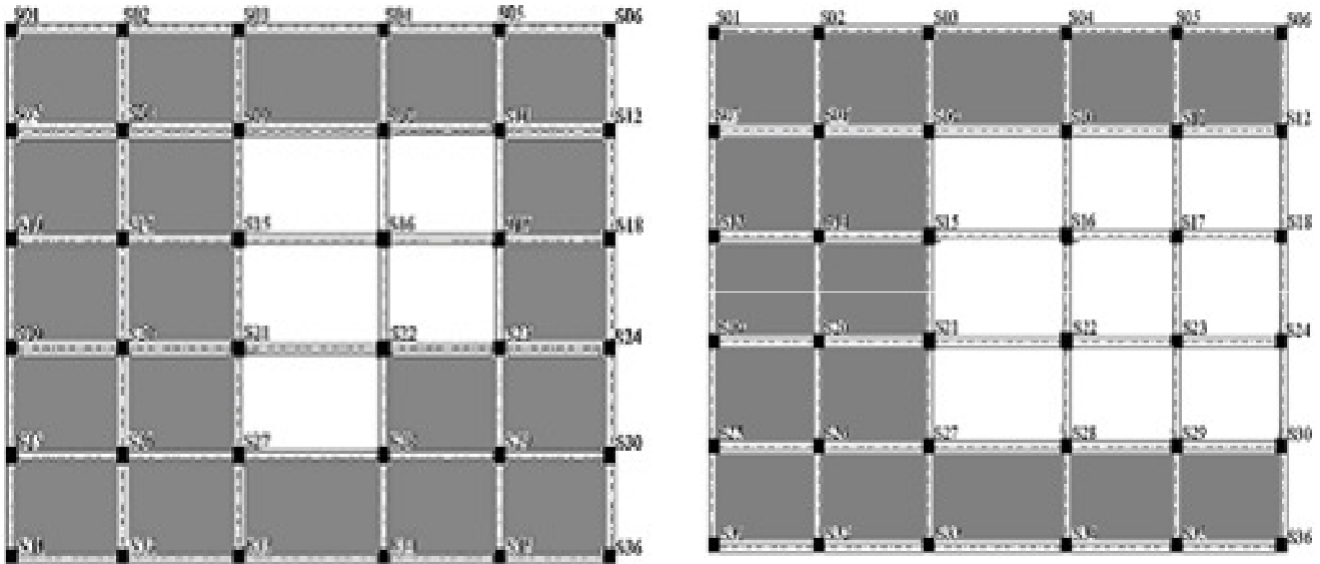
The storey plans and gaps of B4 and B5 buildings.
